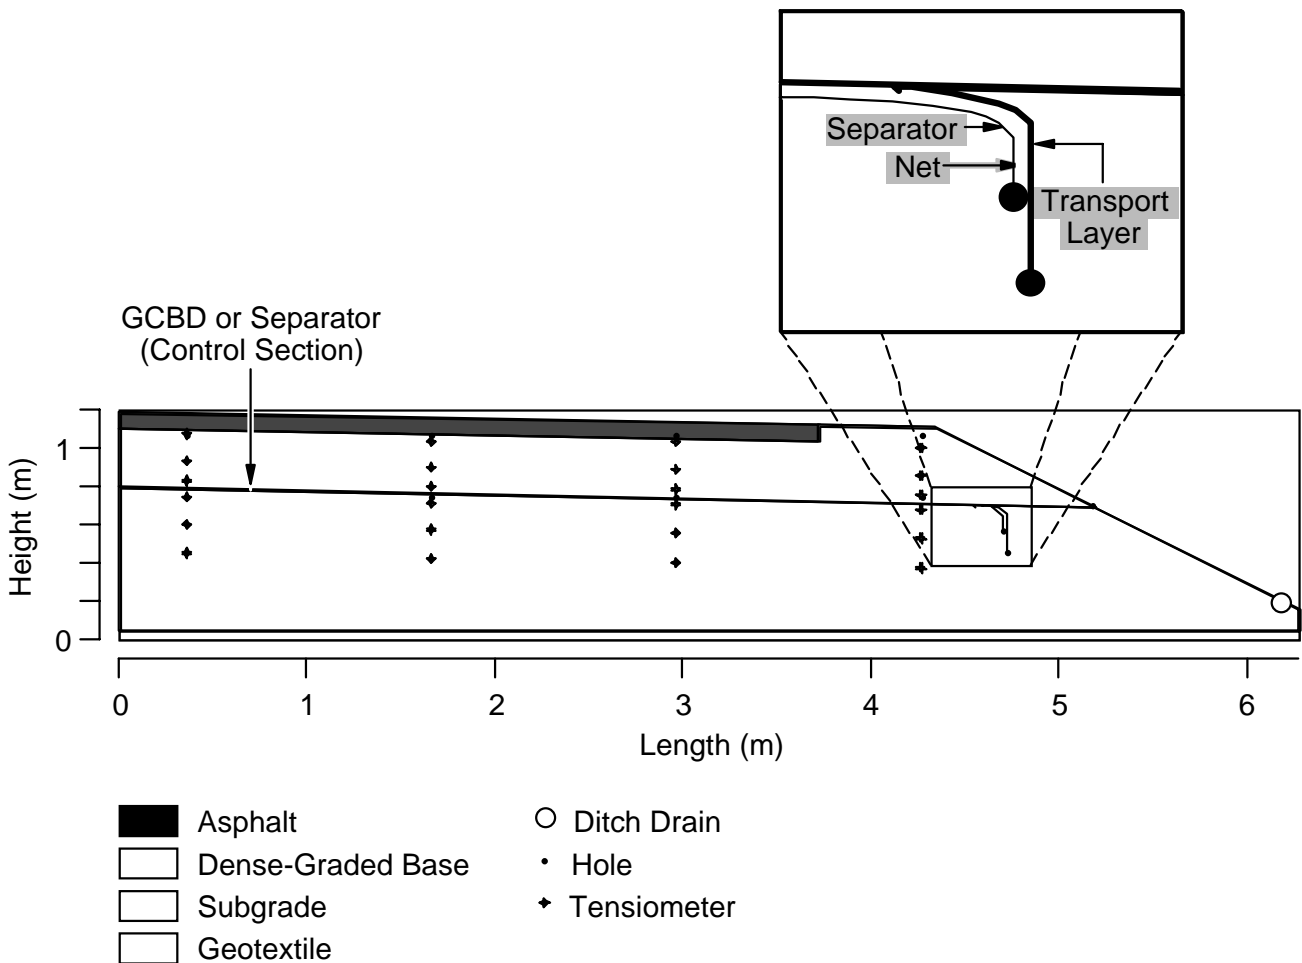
Cross-section of the GCBD test section with vertical drop for water collection.
